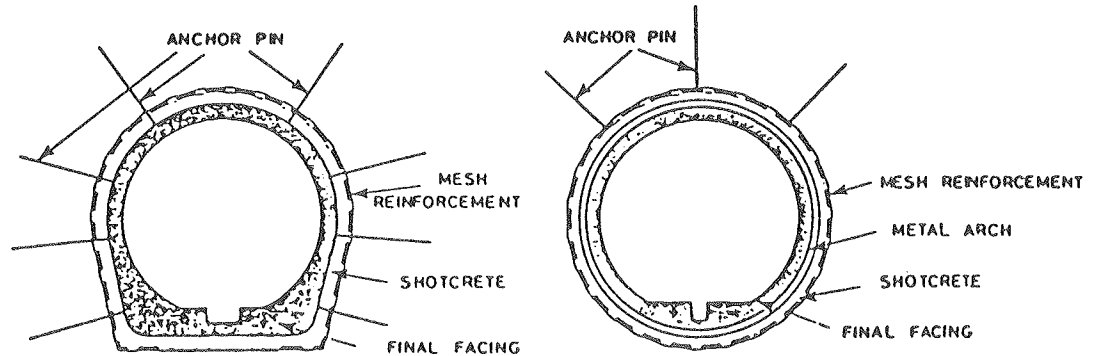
Typical cross sections of the tunnels of the Marseilles underground constructed by soil nailing in 1978.
